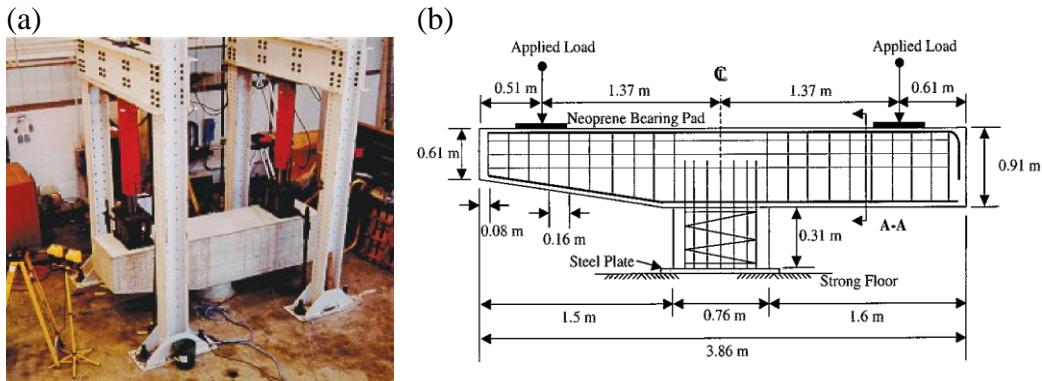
(a) Experimental test set-up, (b) general specimen layout and reinforcement details, TxDOT Project 0-1851 (Bracci et al., 2001)
